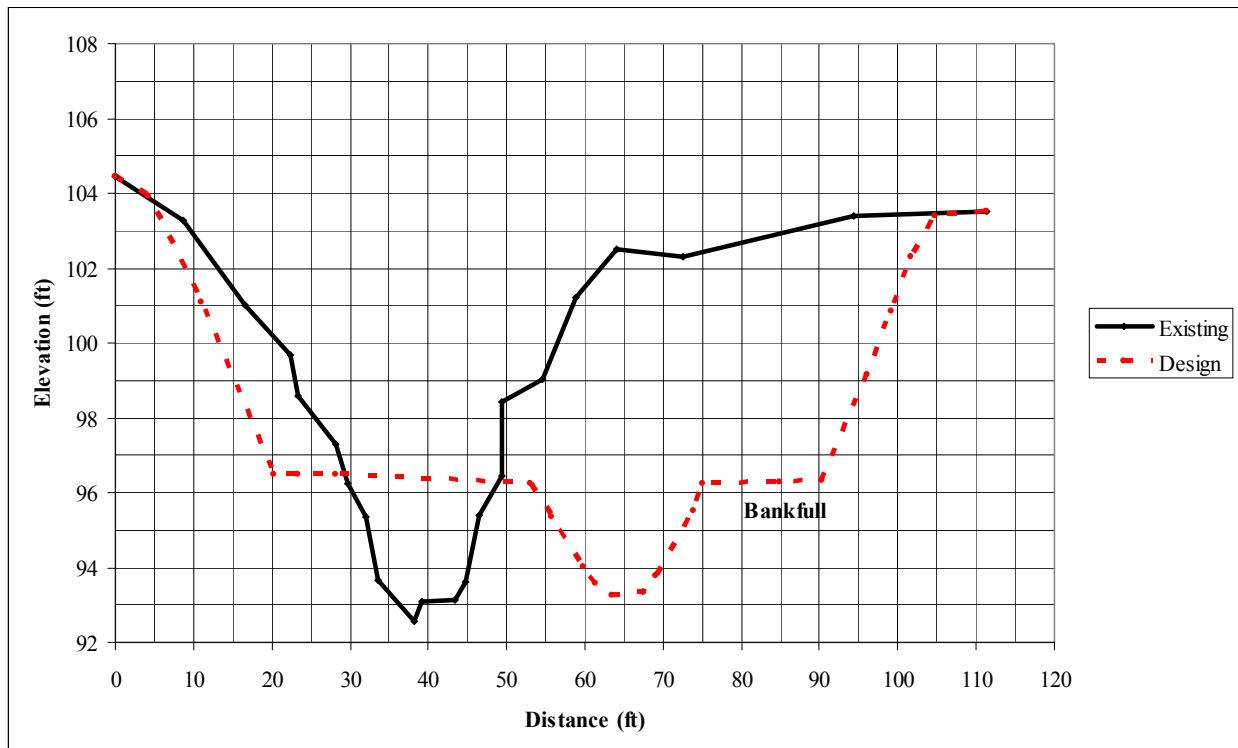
Reach 3 at Cross Section E Facing Downstream.
